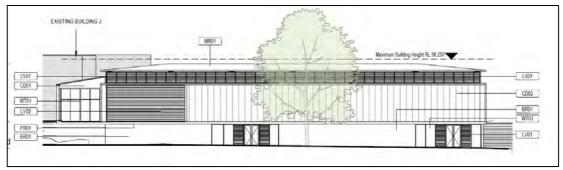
| Western elevation of Building T (Source: EIS 2020)
